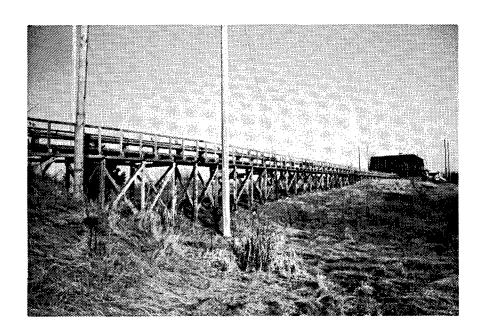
Building 6658: A Nitroglycerin Gutter and Trestle that connects Buildings 6657-2 and 6667-2.
